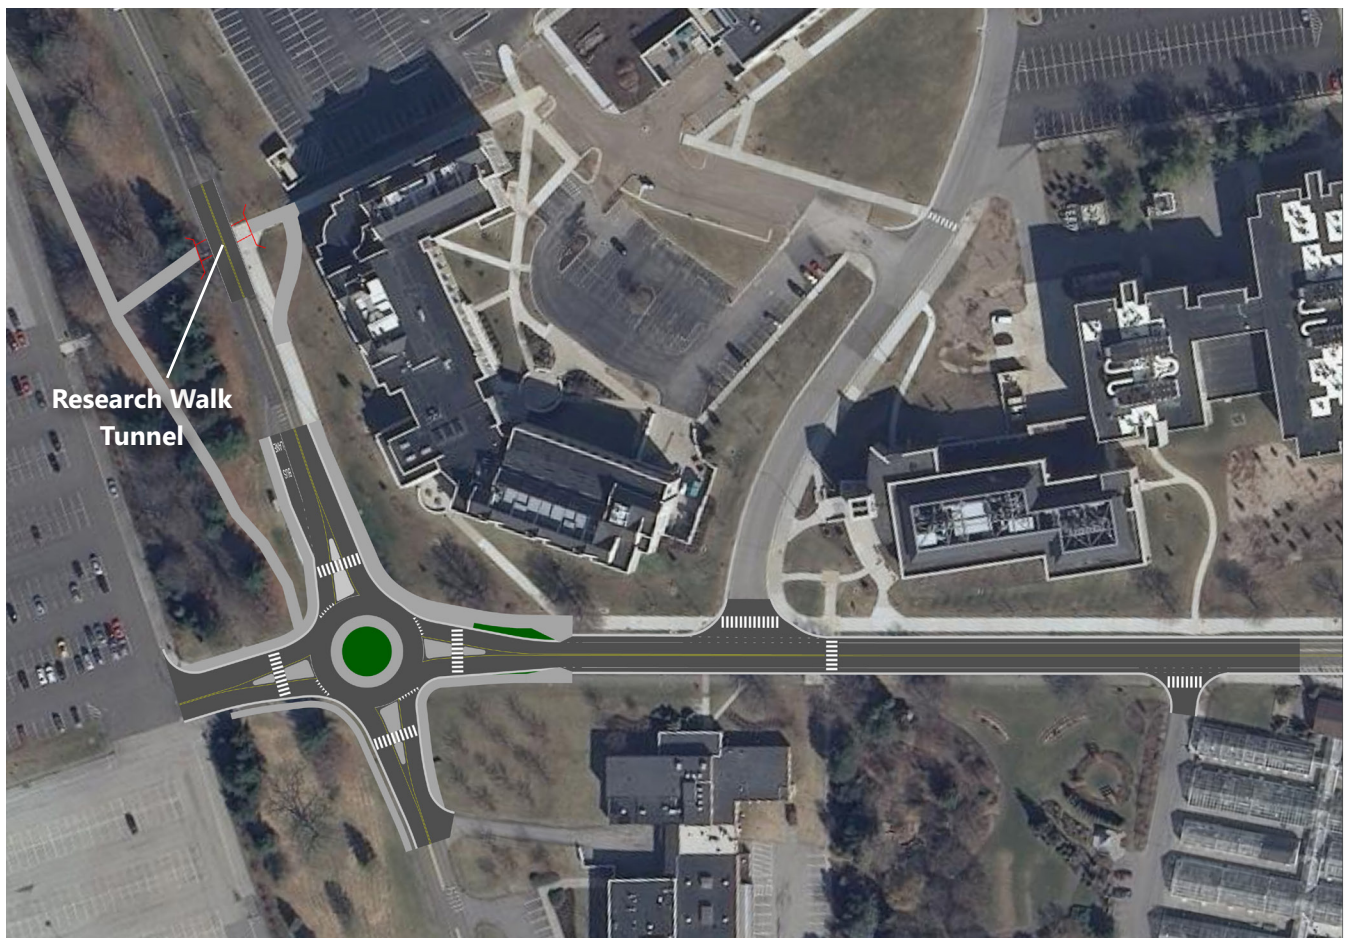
Washington Street at Beamer Way Roundabout Design
